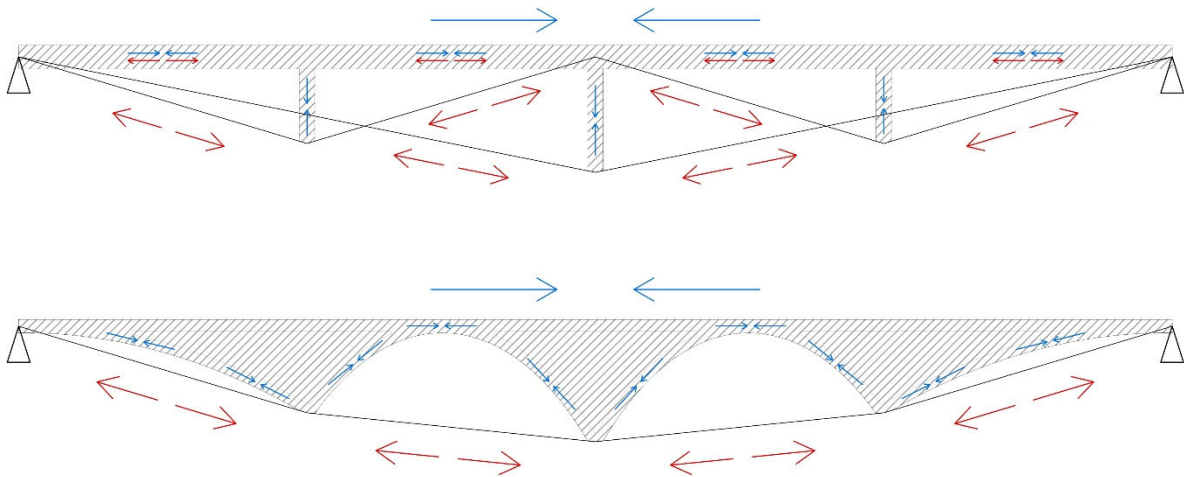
Top) Fink Truss; bottom) 2D scheme of the proposed floor slab.
